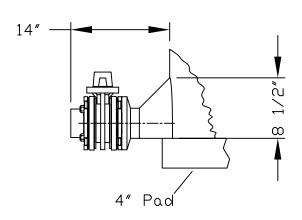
DETAIL "A" (VALVE LAYOUT & CLEARANCE) SCALE: NONE
